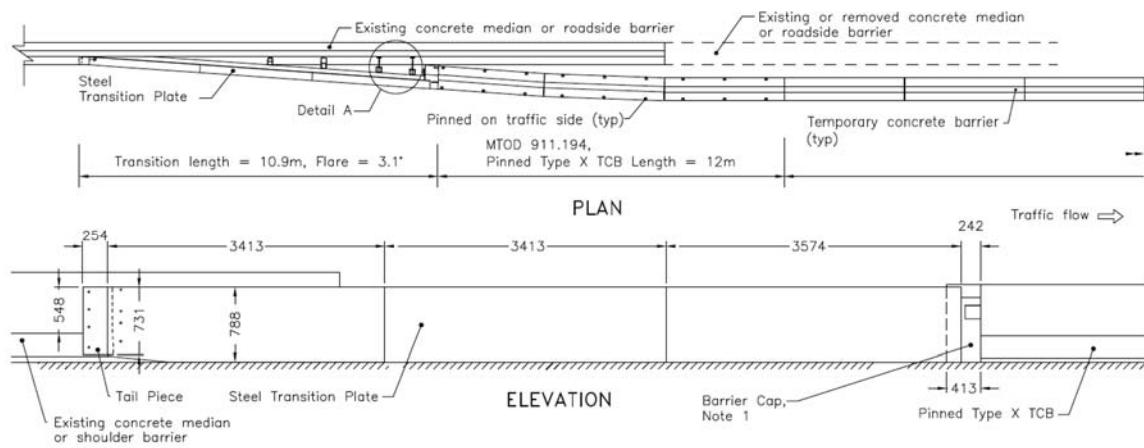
Transition from Permanent Concrete Barrier to Temporary Concrete Barrier
